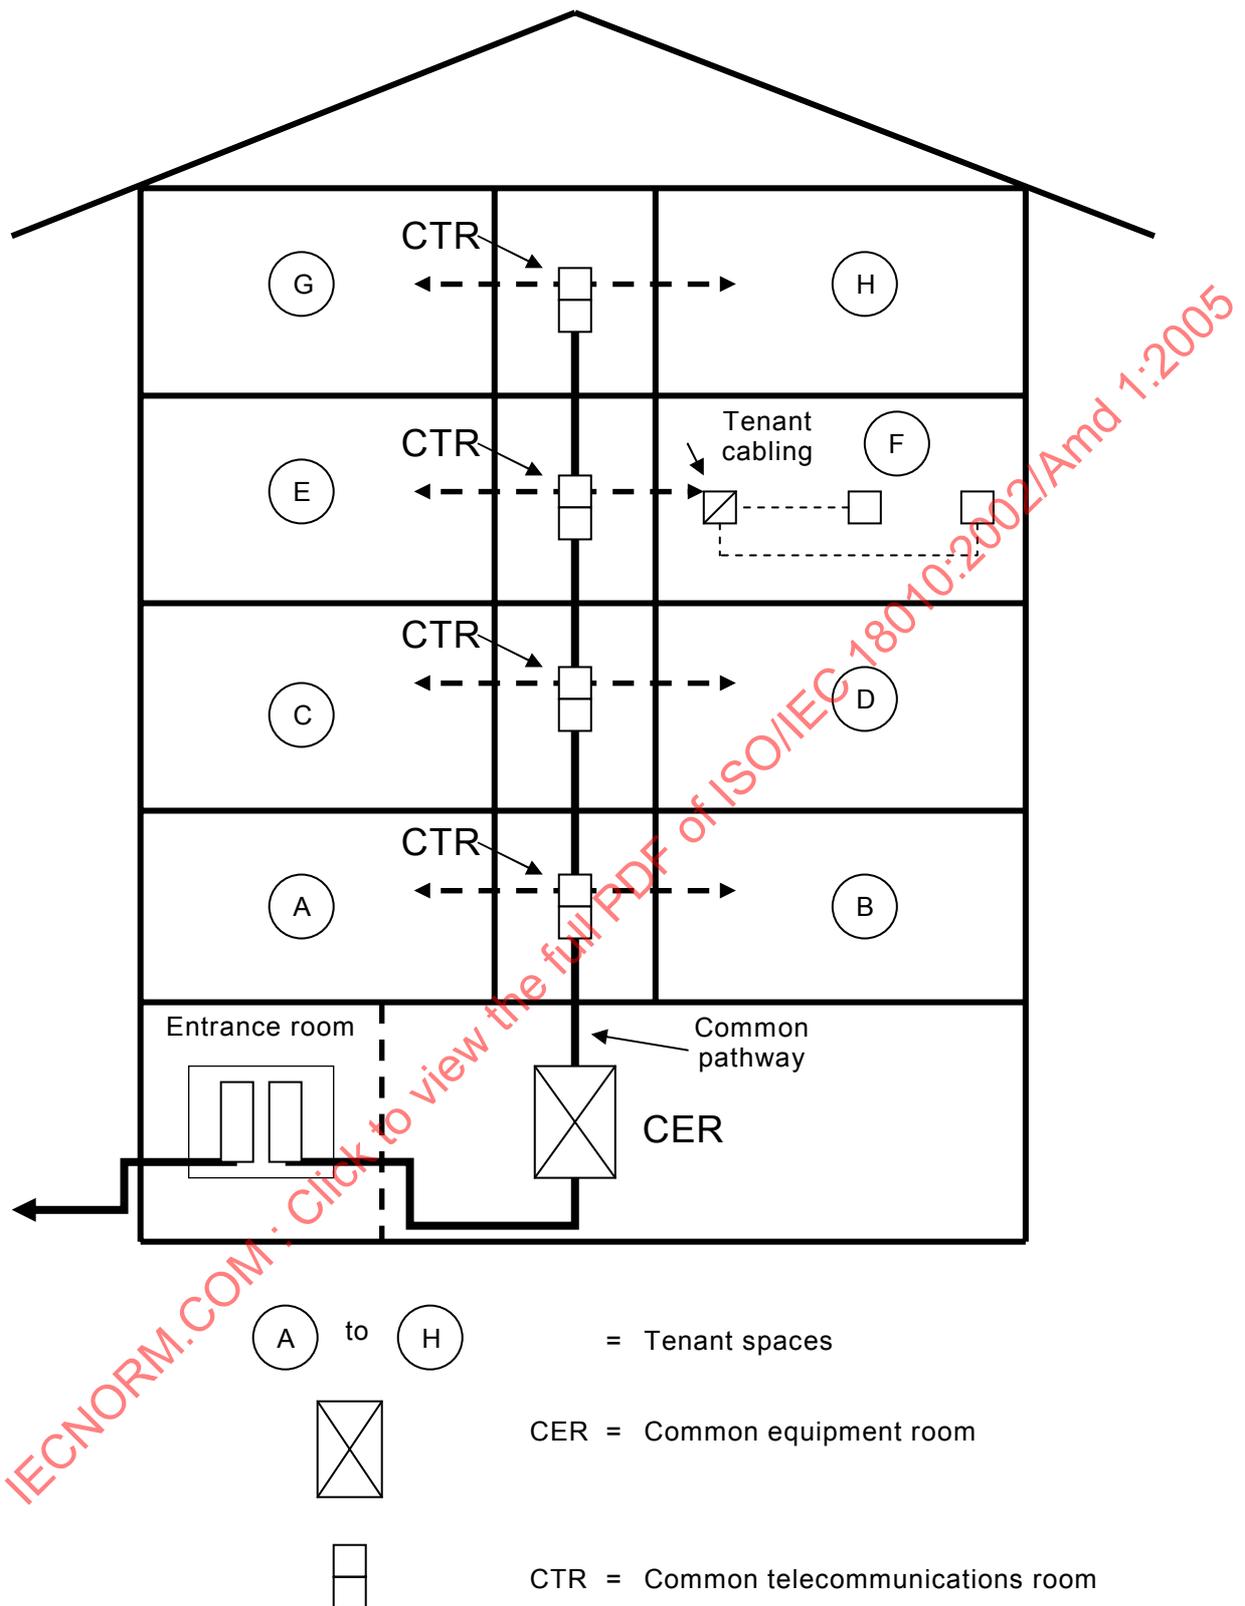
Example of pathways and spaces components used to service a multi-tenant building
